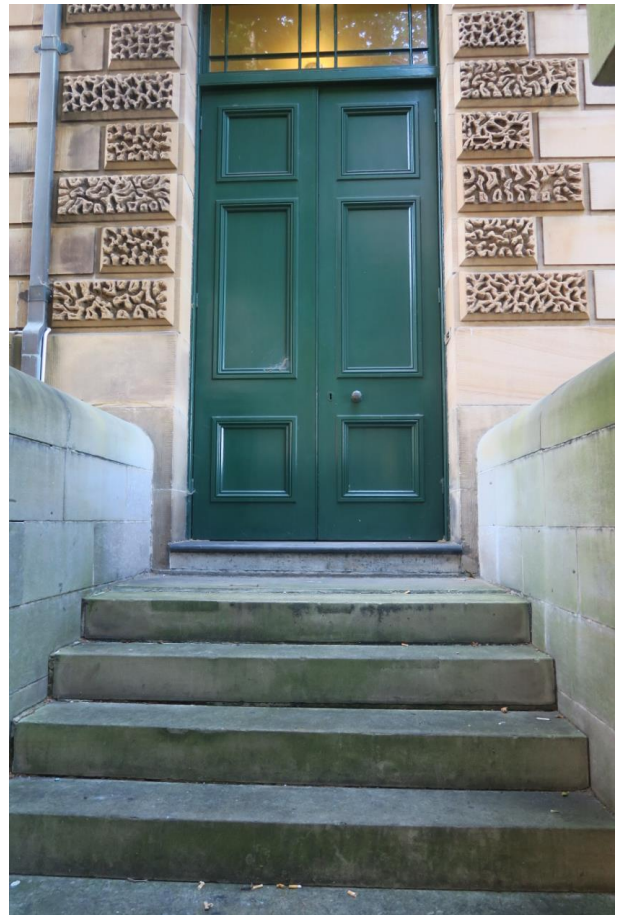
Bridge Street entrance steeps and bridge (reconstructed).
